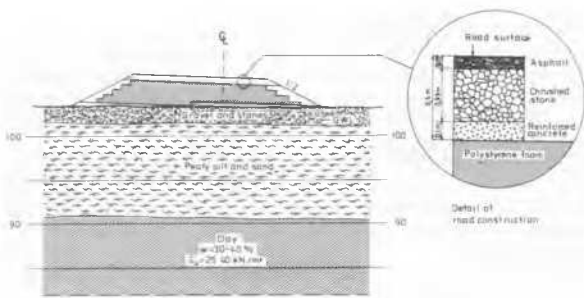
Cross-sectional profile of road embankment at Lenken bridge
